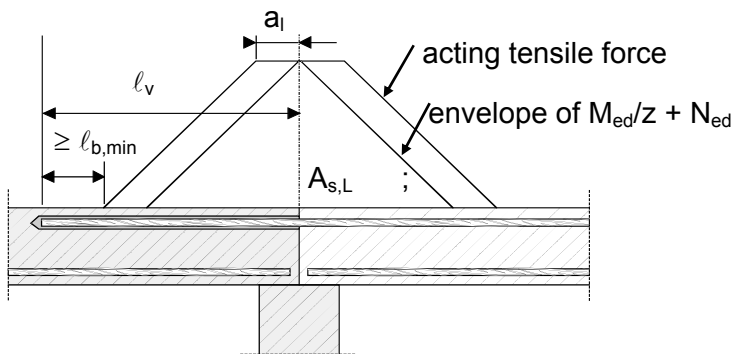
Anchoring of reinforcement to cover the line of acting tensile force
